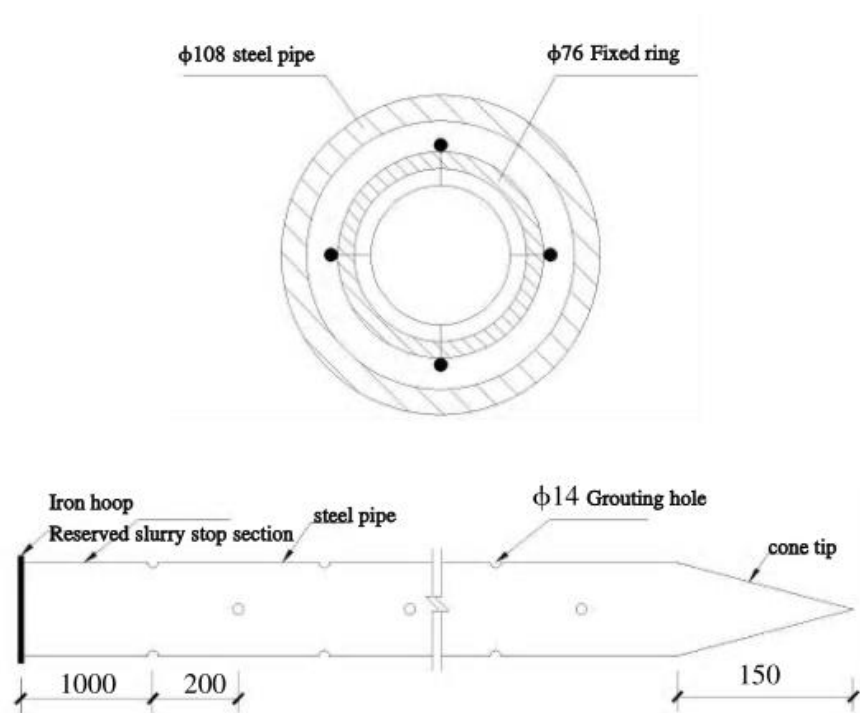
Section and conduit structure of large pipe shed (unit: cm).
